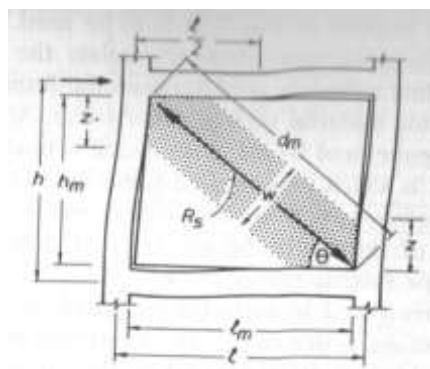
Confined masonry deformation under shear loading (Paulay, 1992)
